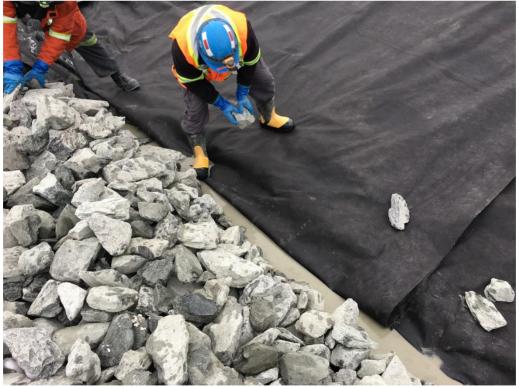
On going process of patching the damaged geotextile. The sheet has been folded on over a 1m to ensure proper overlap of the damaged area.
